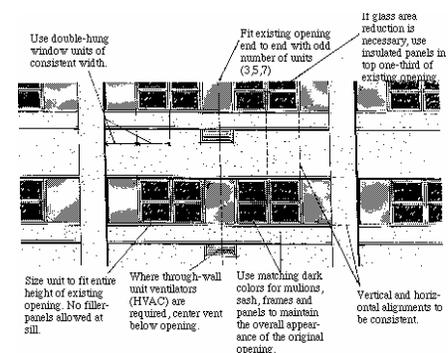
Criteria for replacement of existing horizontal strip windows.
